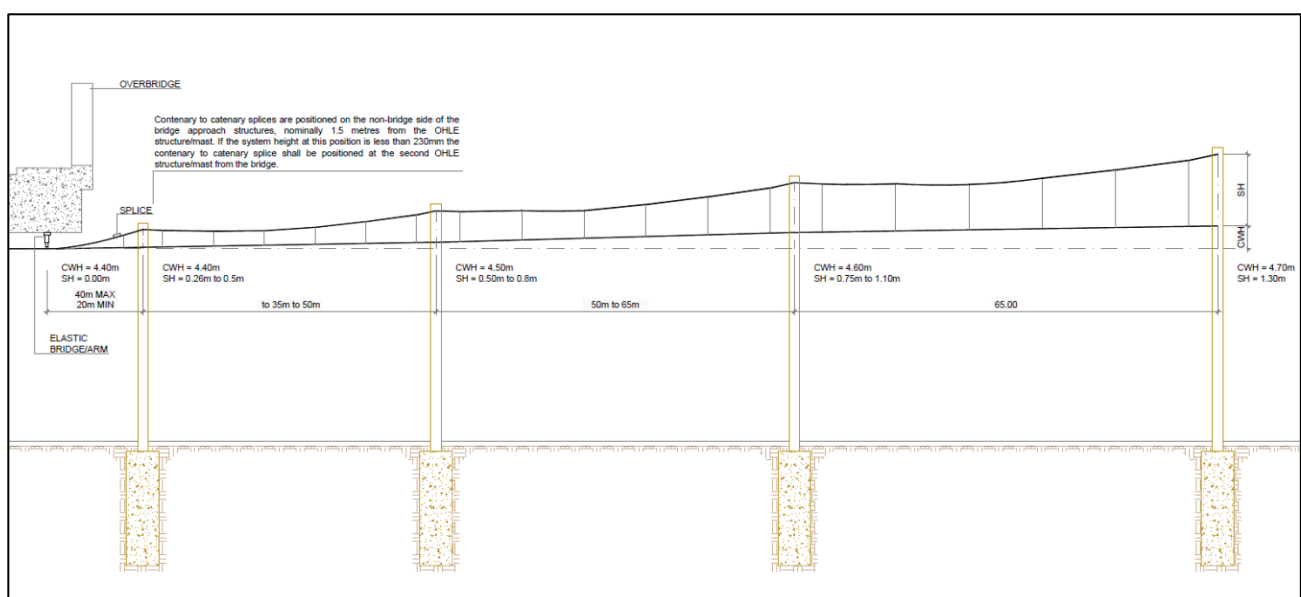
Typical Arrangement on approach to a Low Bridge
